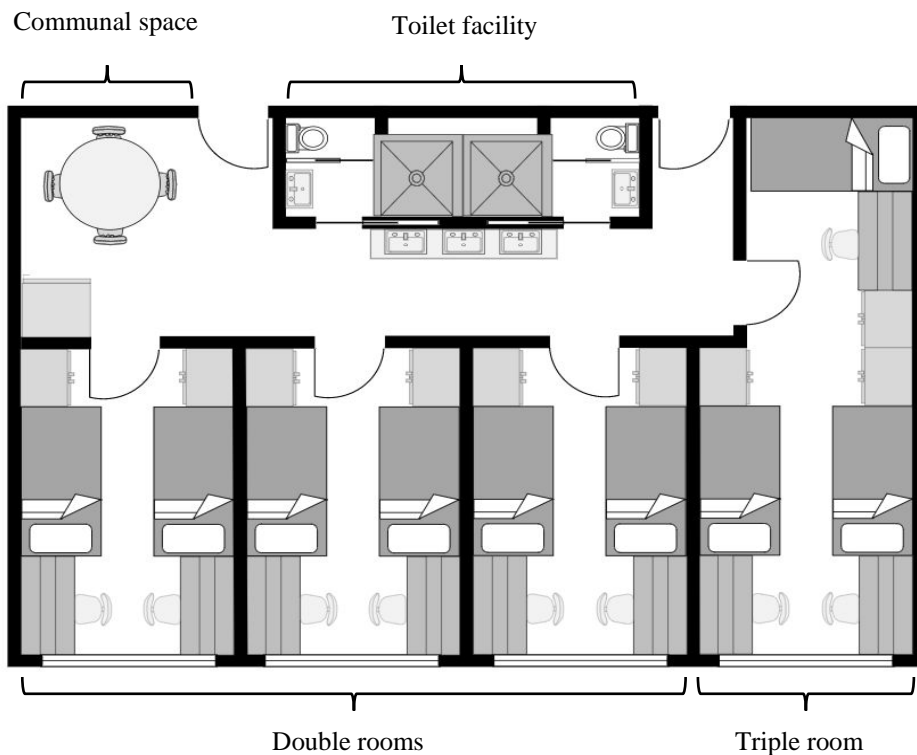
Layout of a typical 9-person suite with details of double rooms, triple rooms, communal space and toilet facility.
